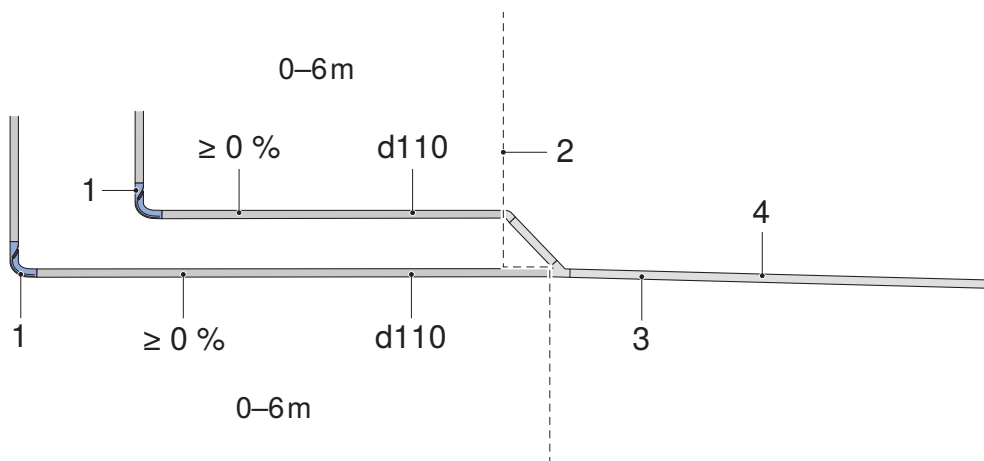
Connection of several stacks with Geberit SuperTube to the collector pipe
